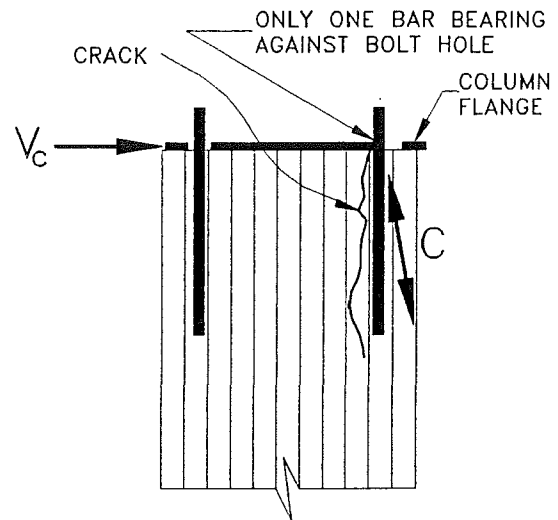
The worst case - only a few bars are bearing against the bolt holes
